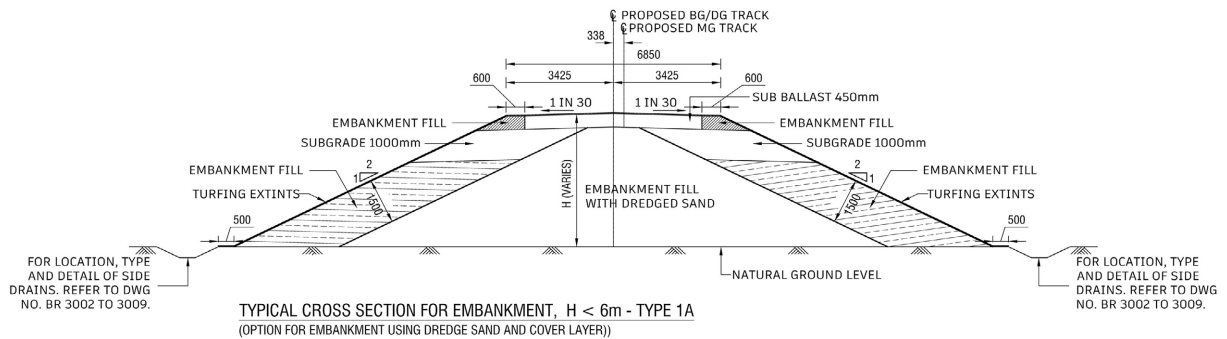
Typical cross section for embankment height less than 6 m (Type 1A).
